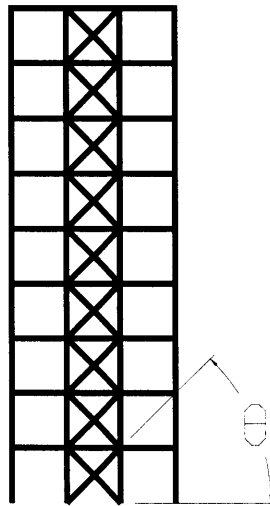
Proposed Structural Diagonal Bracing Angle
